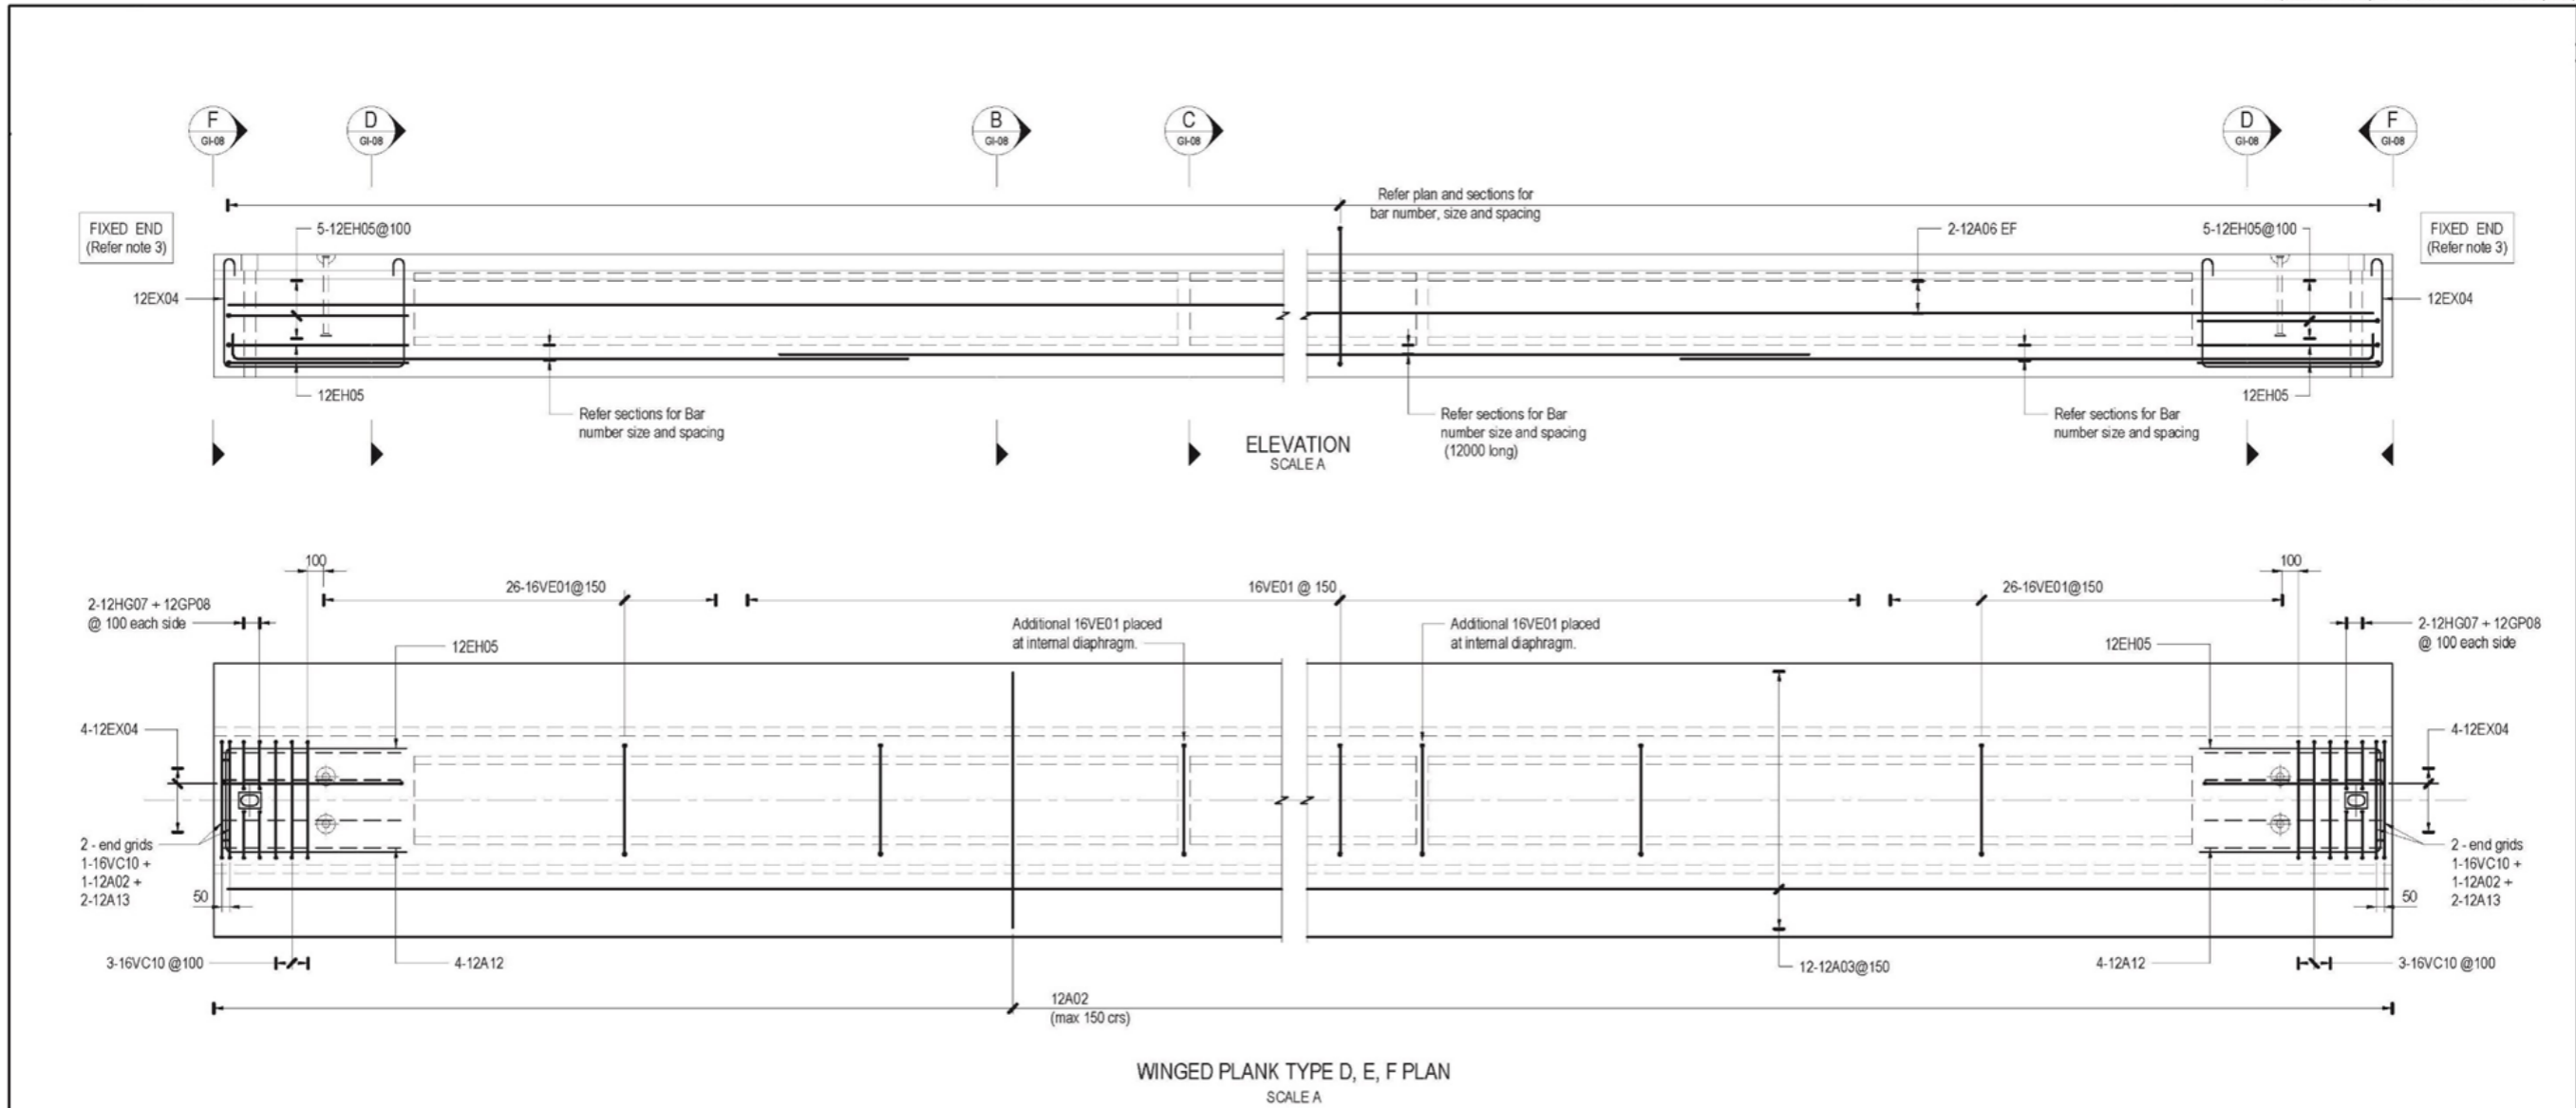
(p) - Example winged plank bridge drawings - Sheet 6
